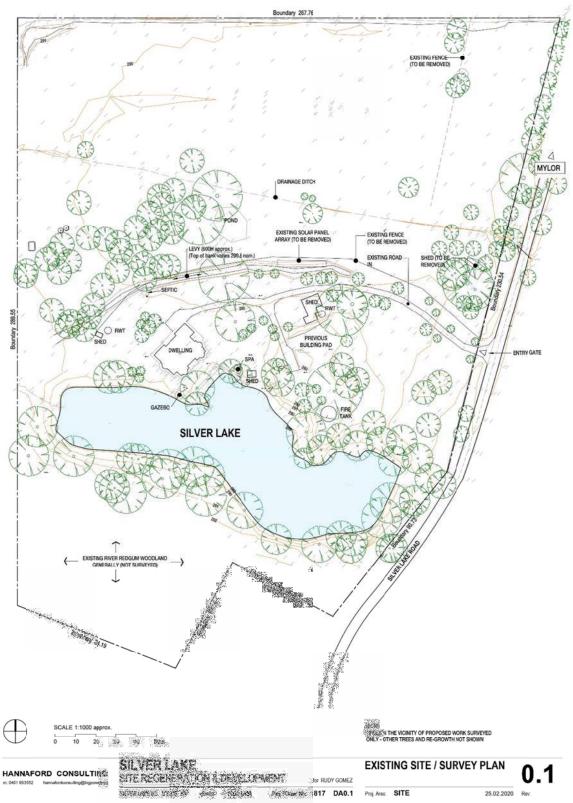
Existing Site/Survey Plan (refer also to Architectural Drawing Set)
